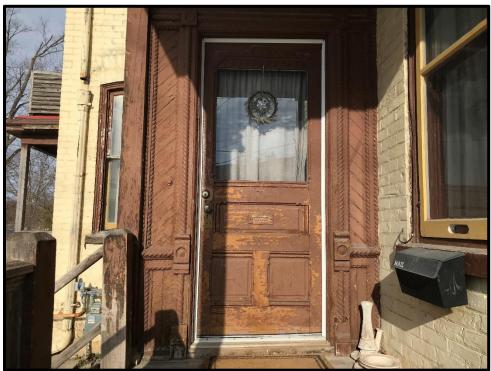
Subject Property – 60 Ellen Street Entrance Door with Decorative Woodwork (Photo taken December 20, 2021; Facing North)
